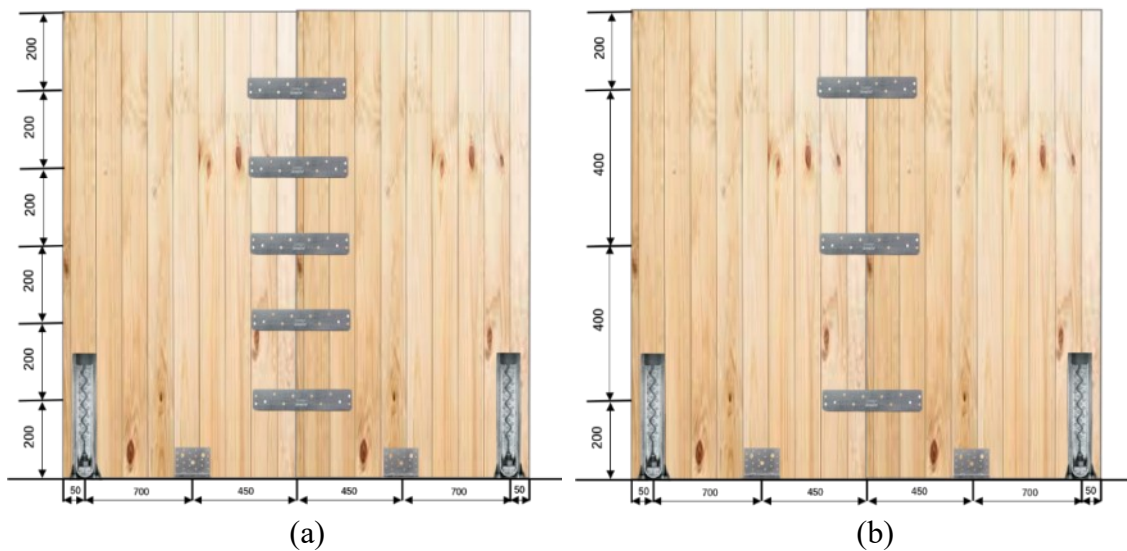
Shear wall layout: (a) Single wall behaviour (SW); (b) Coupled-panel behaviour (CP) (dimensions in mm)
